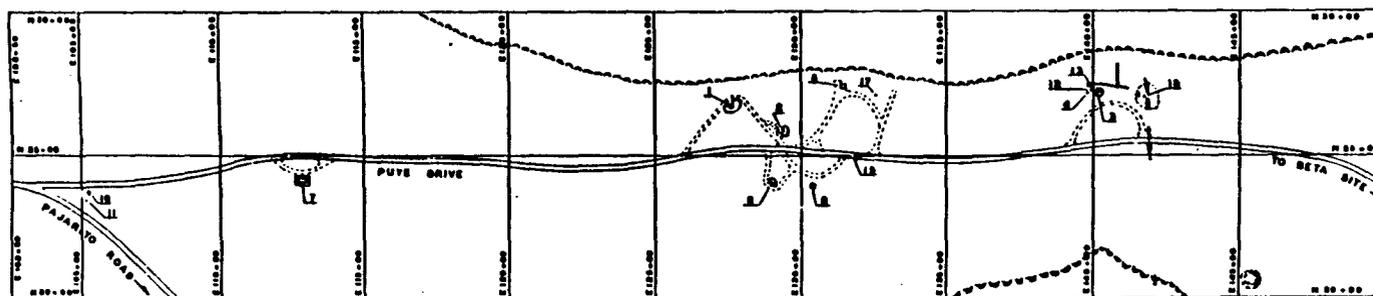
Location and Site Plan for TA-4 - Alpha Site
